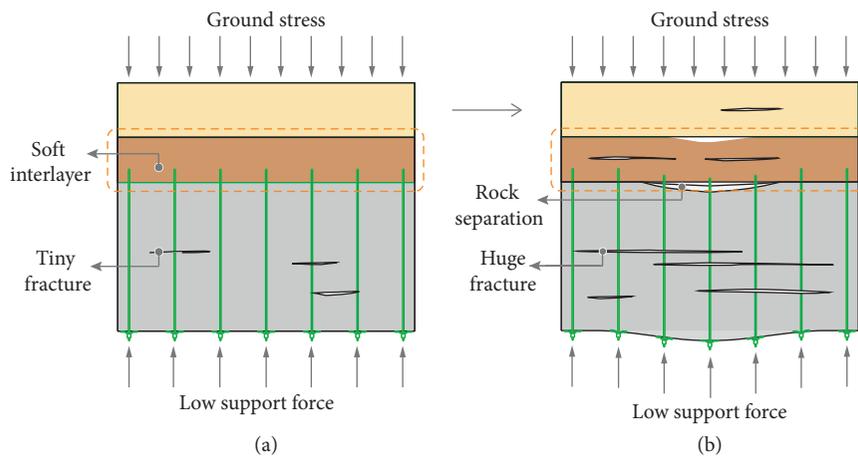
Support failure mechanism: (a) initial small deformation of rock mass; (b) rock deformation and rock separation failure.
